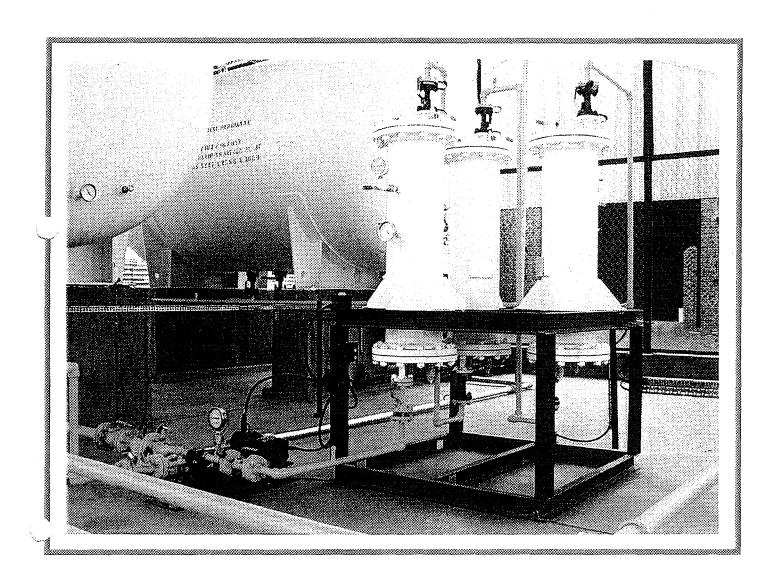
DETAIL OF LPG STORAGE AREA SHOWING RECIRCULATION PUMP AND PIPEWORK DETAIL
